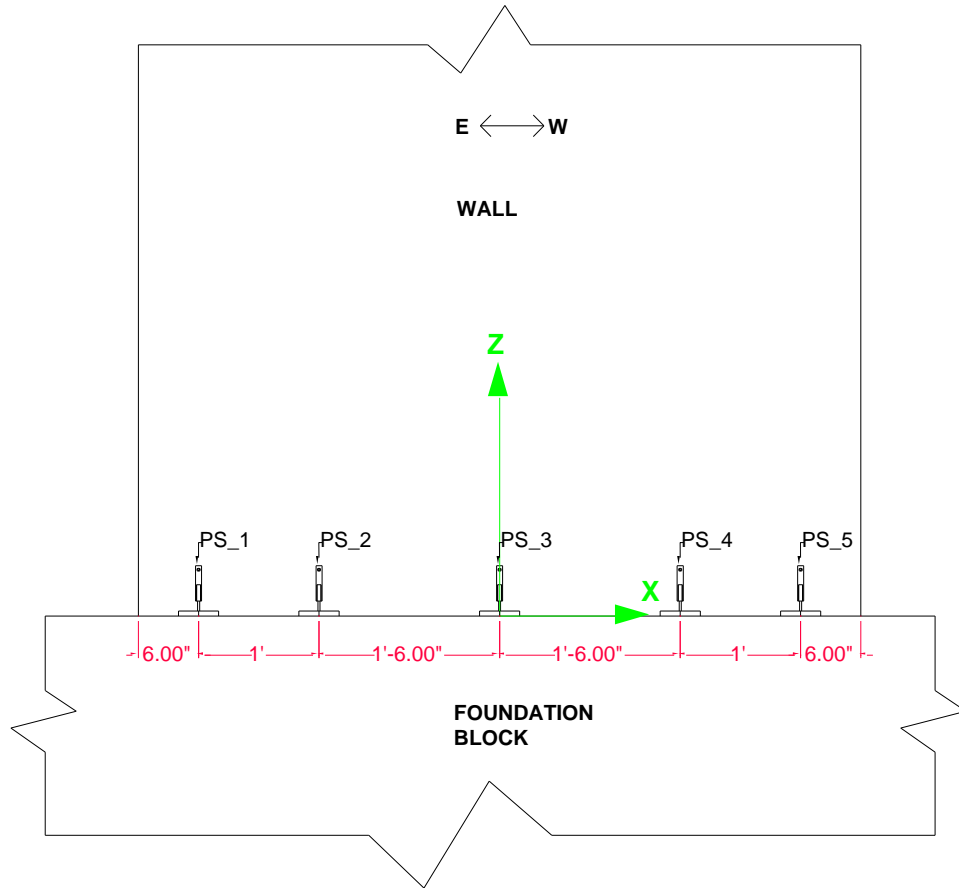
Plastic slides on Wall 2 and Wall 3
